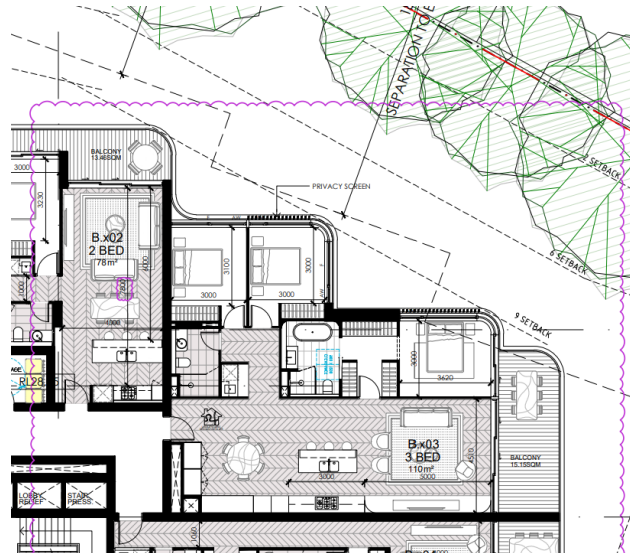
Extract of Level 3 plan showing privacy screens along northern windows and part of balconies (Source: PBD Architects)
